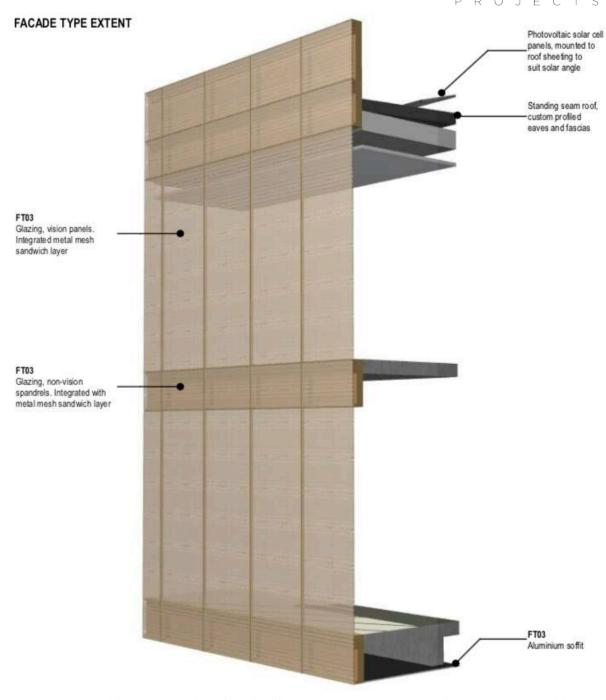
Building D proposed northern façade (Source: FJMT, DA-5902 Facade Diagrams FT03 Building D, 18.12.19)
